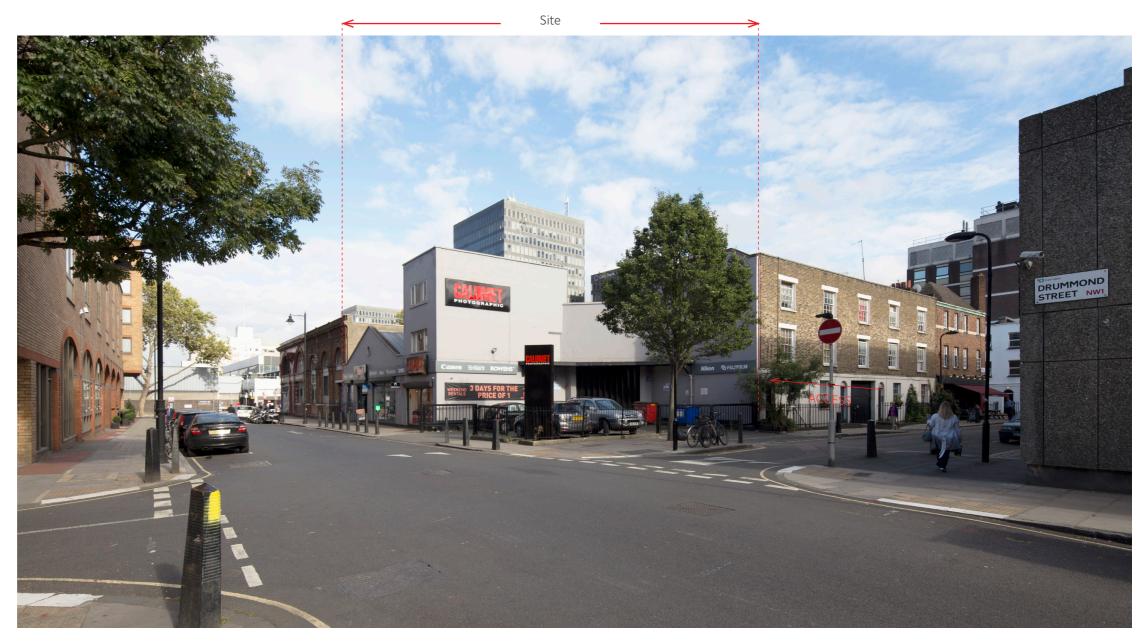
VIEW OF THE PROPOSED DEVELOPMENT SITE FROM NORTH EAST (THE CORNER OF DRUMMOND STREET AND COBURG STREET)
